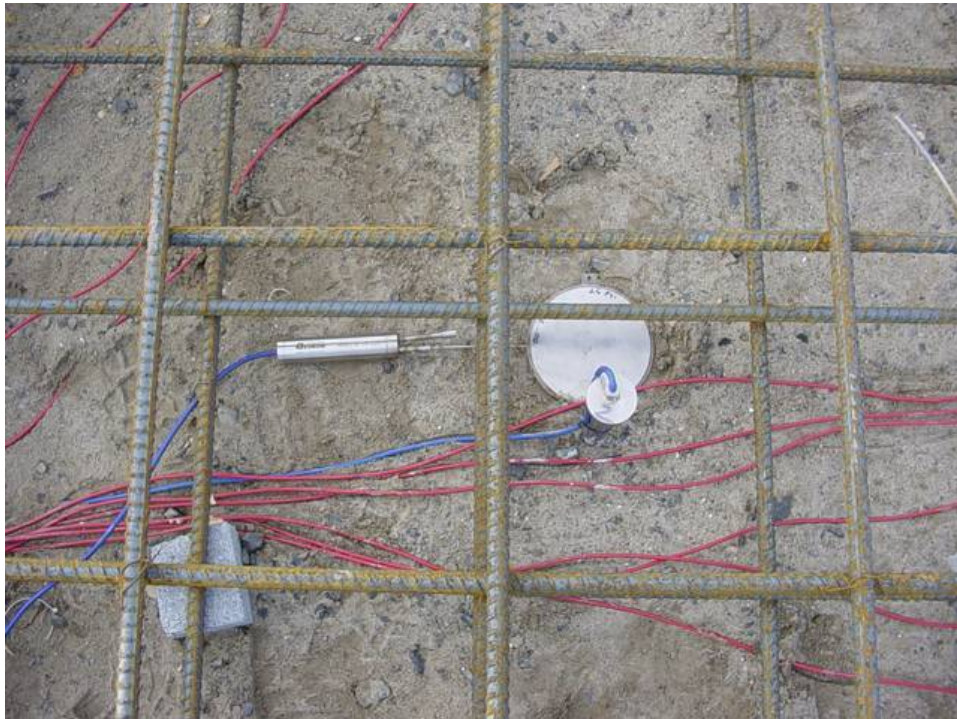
Pressure Cell installed underneath Approach Slab near the VW Deformation Meter.
